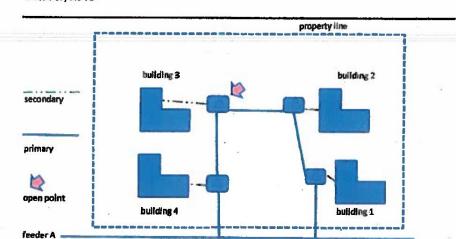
MULTI BUILDING CONNECTION greater than 1,000kVA
